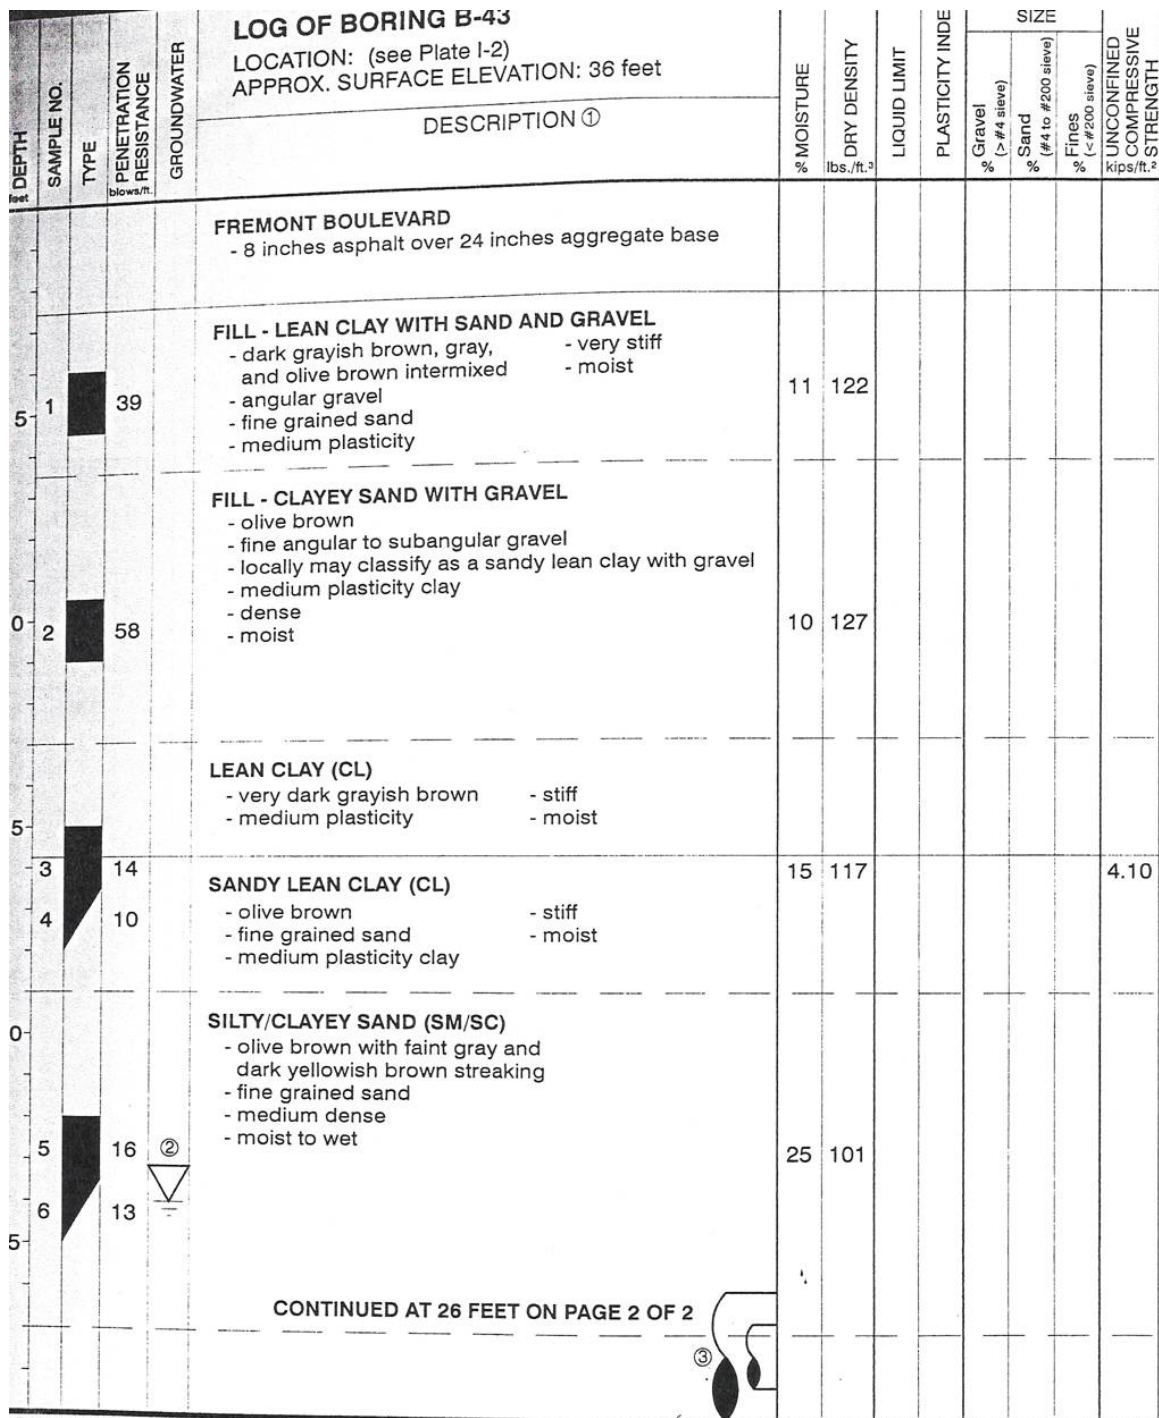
Boring B-43 Drilled at the Approximate Location of the Jacking Shaft on Drive 17 (Mathy et al., 2002).
